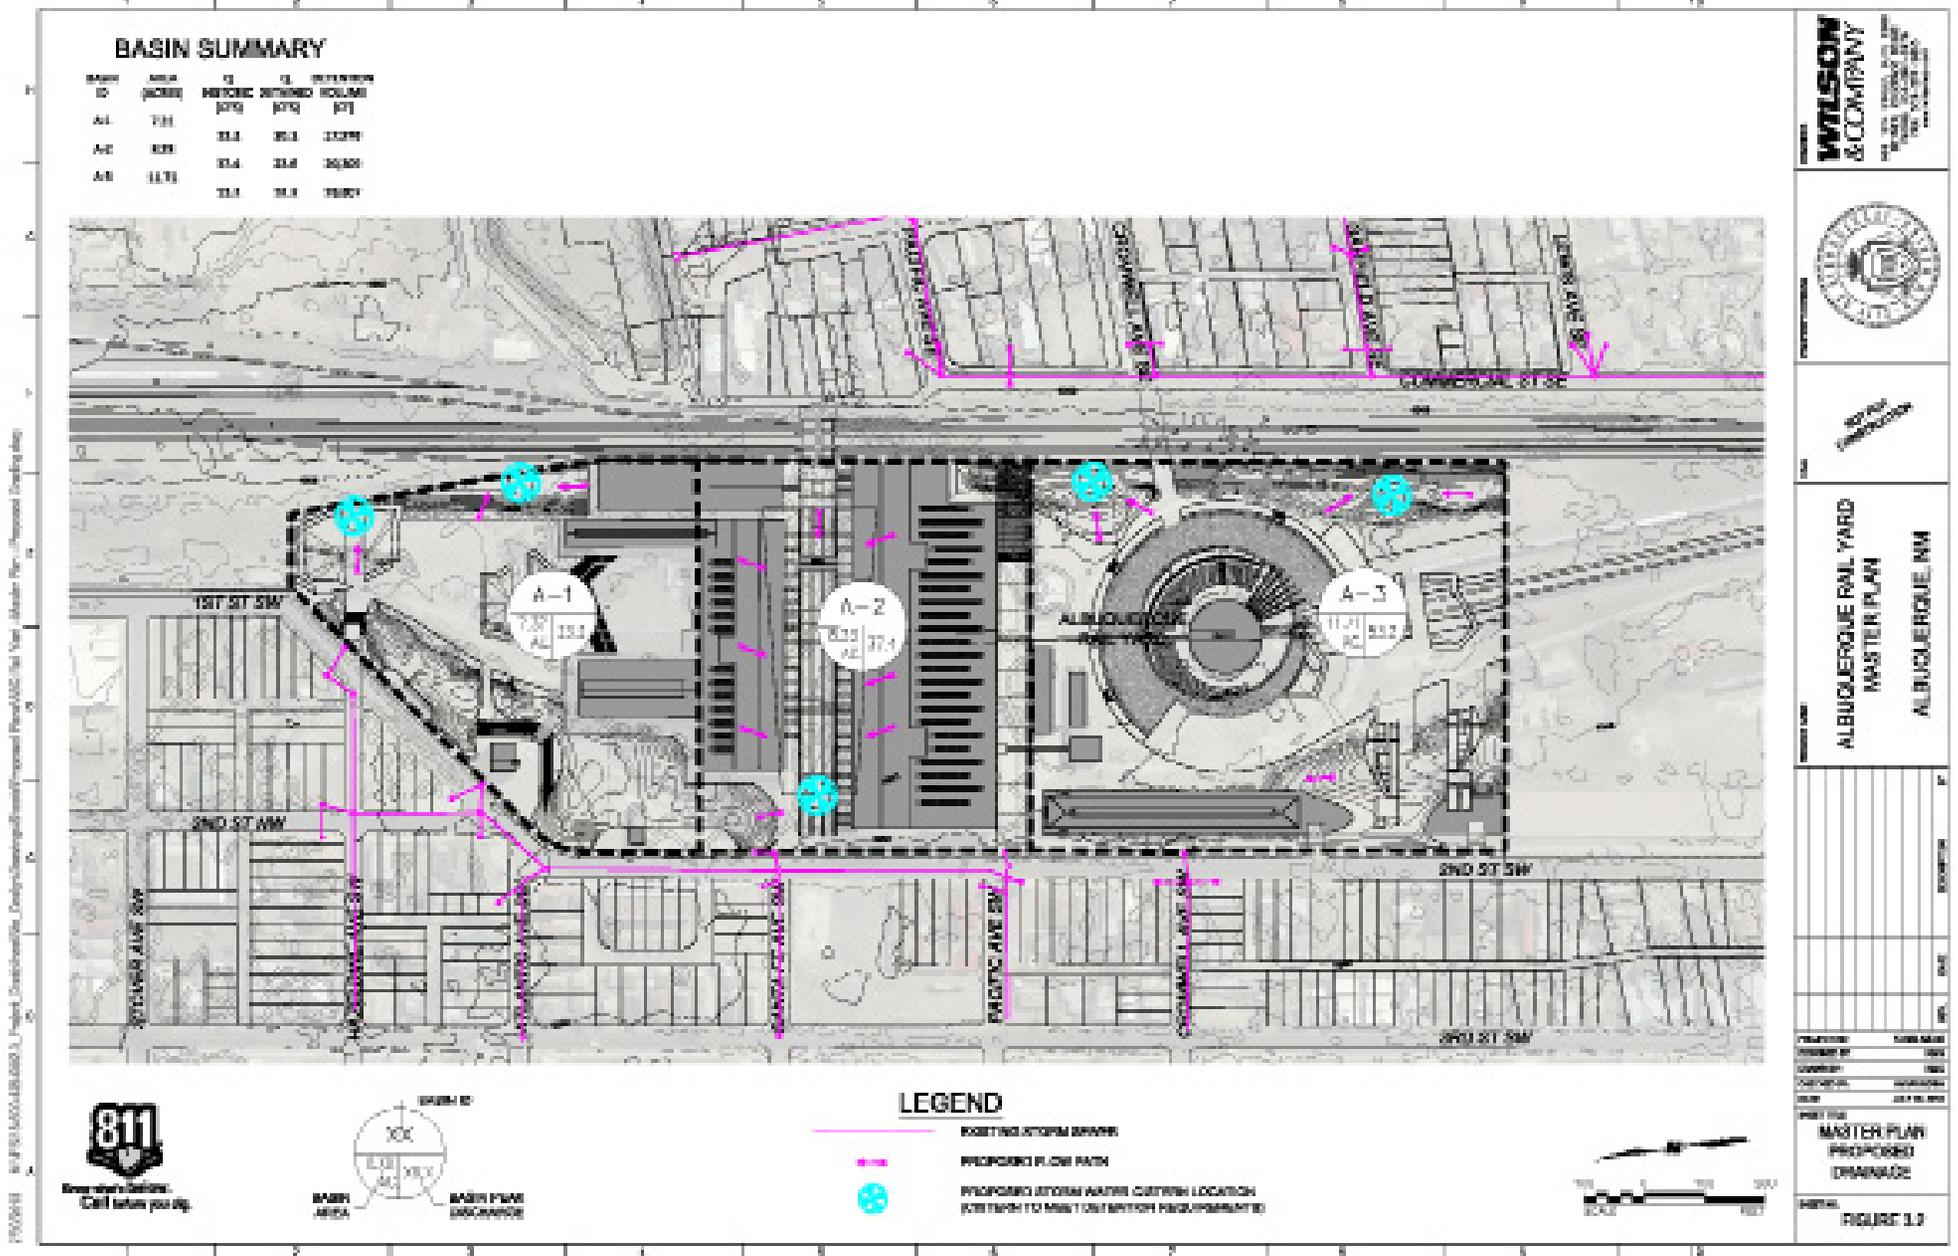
Master Plan - Proposed Conceptual Drainage Plan
